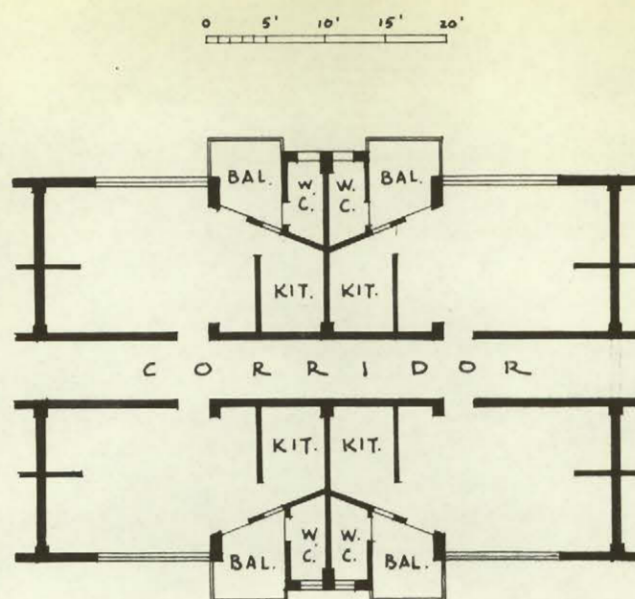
Plan of Typical Unit, Sheung Li Uk.
